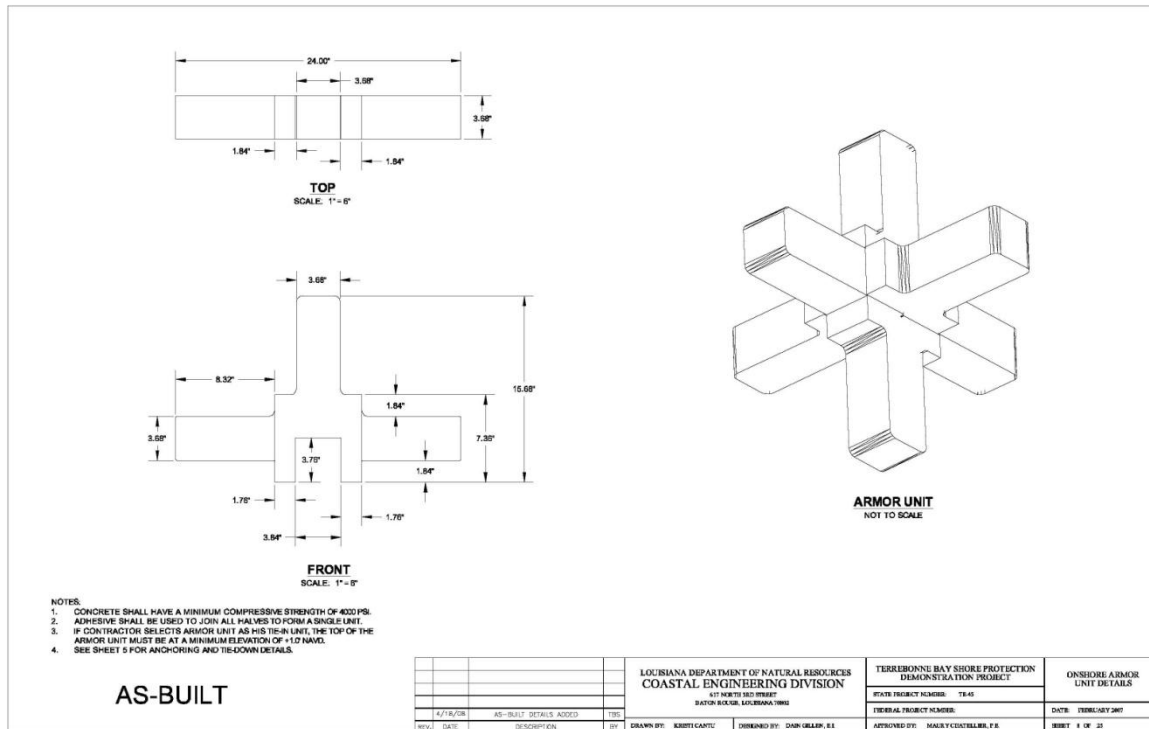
Design drawings showing the Terrebonne Bay Shore Protection Demonstration (TE-45) project's A-Jack structure.
